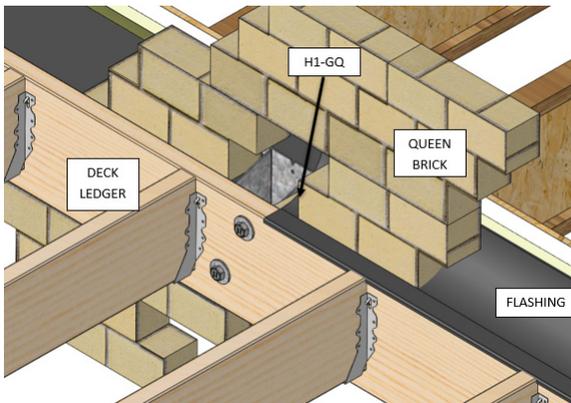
TYPICAL STANDALONE QUEEN BRACKET (H1-GQ) INSTALLATION
